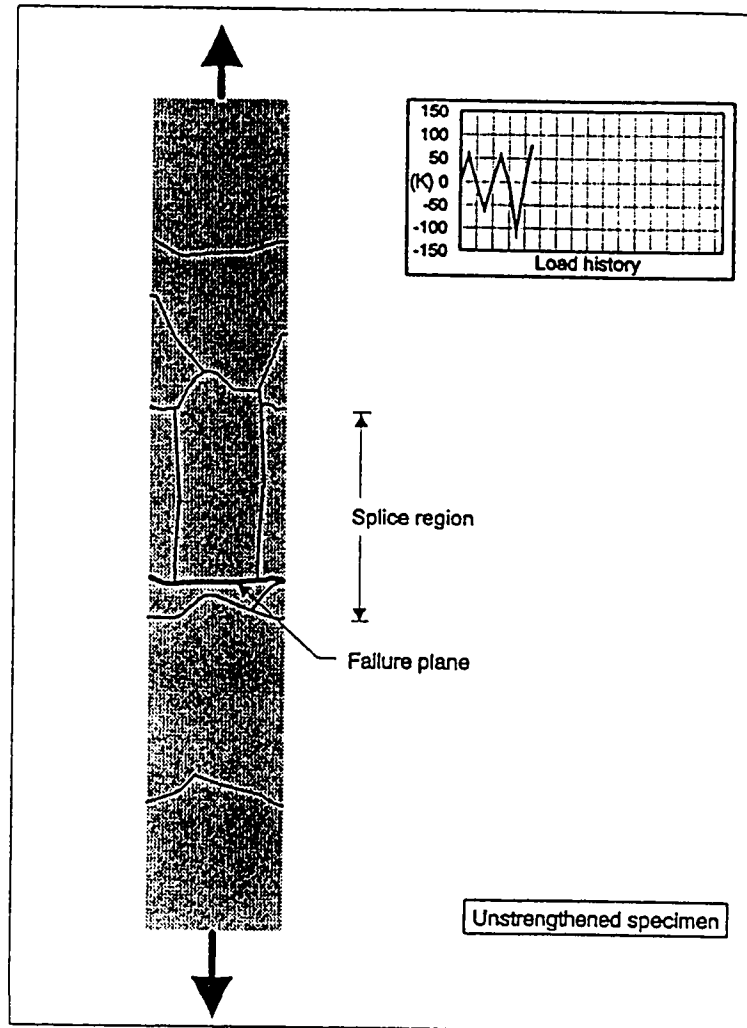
Strengthening of Columns With Inadequate Lap Splices, Crack Pattern in the Basic Unretrofitted Column, Ref.[23].
